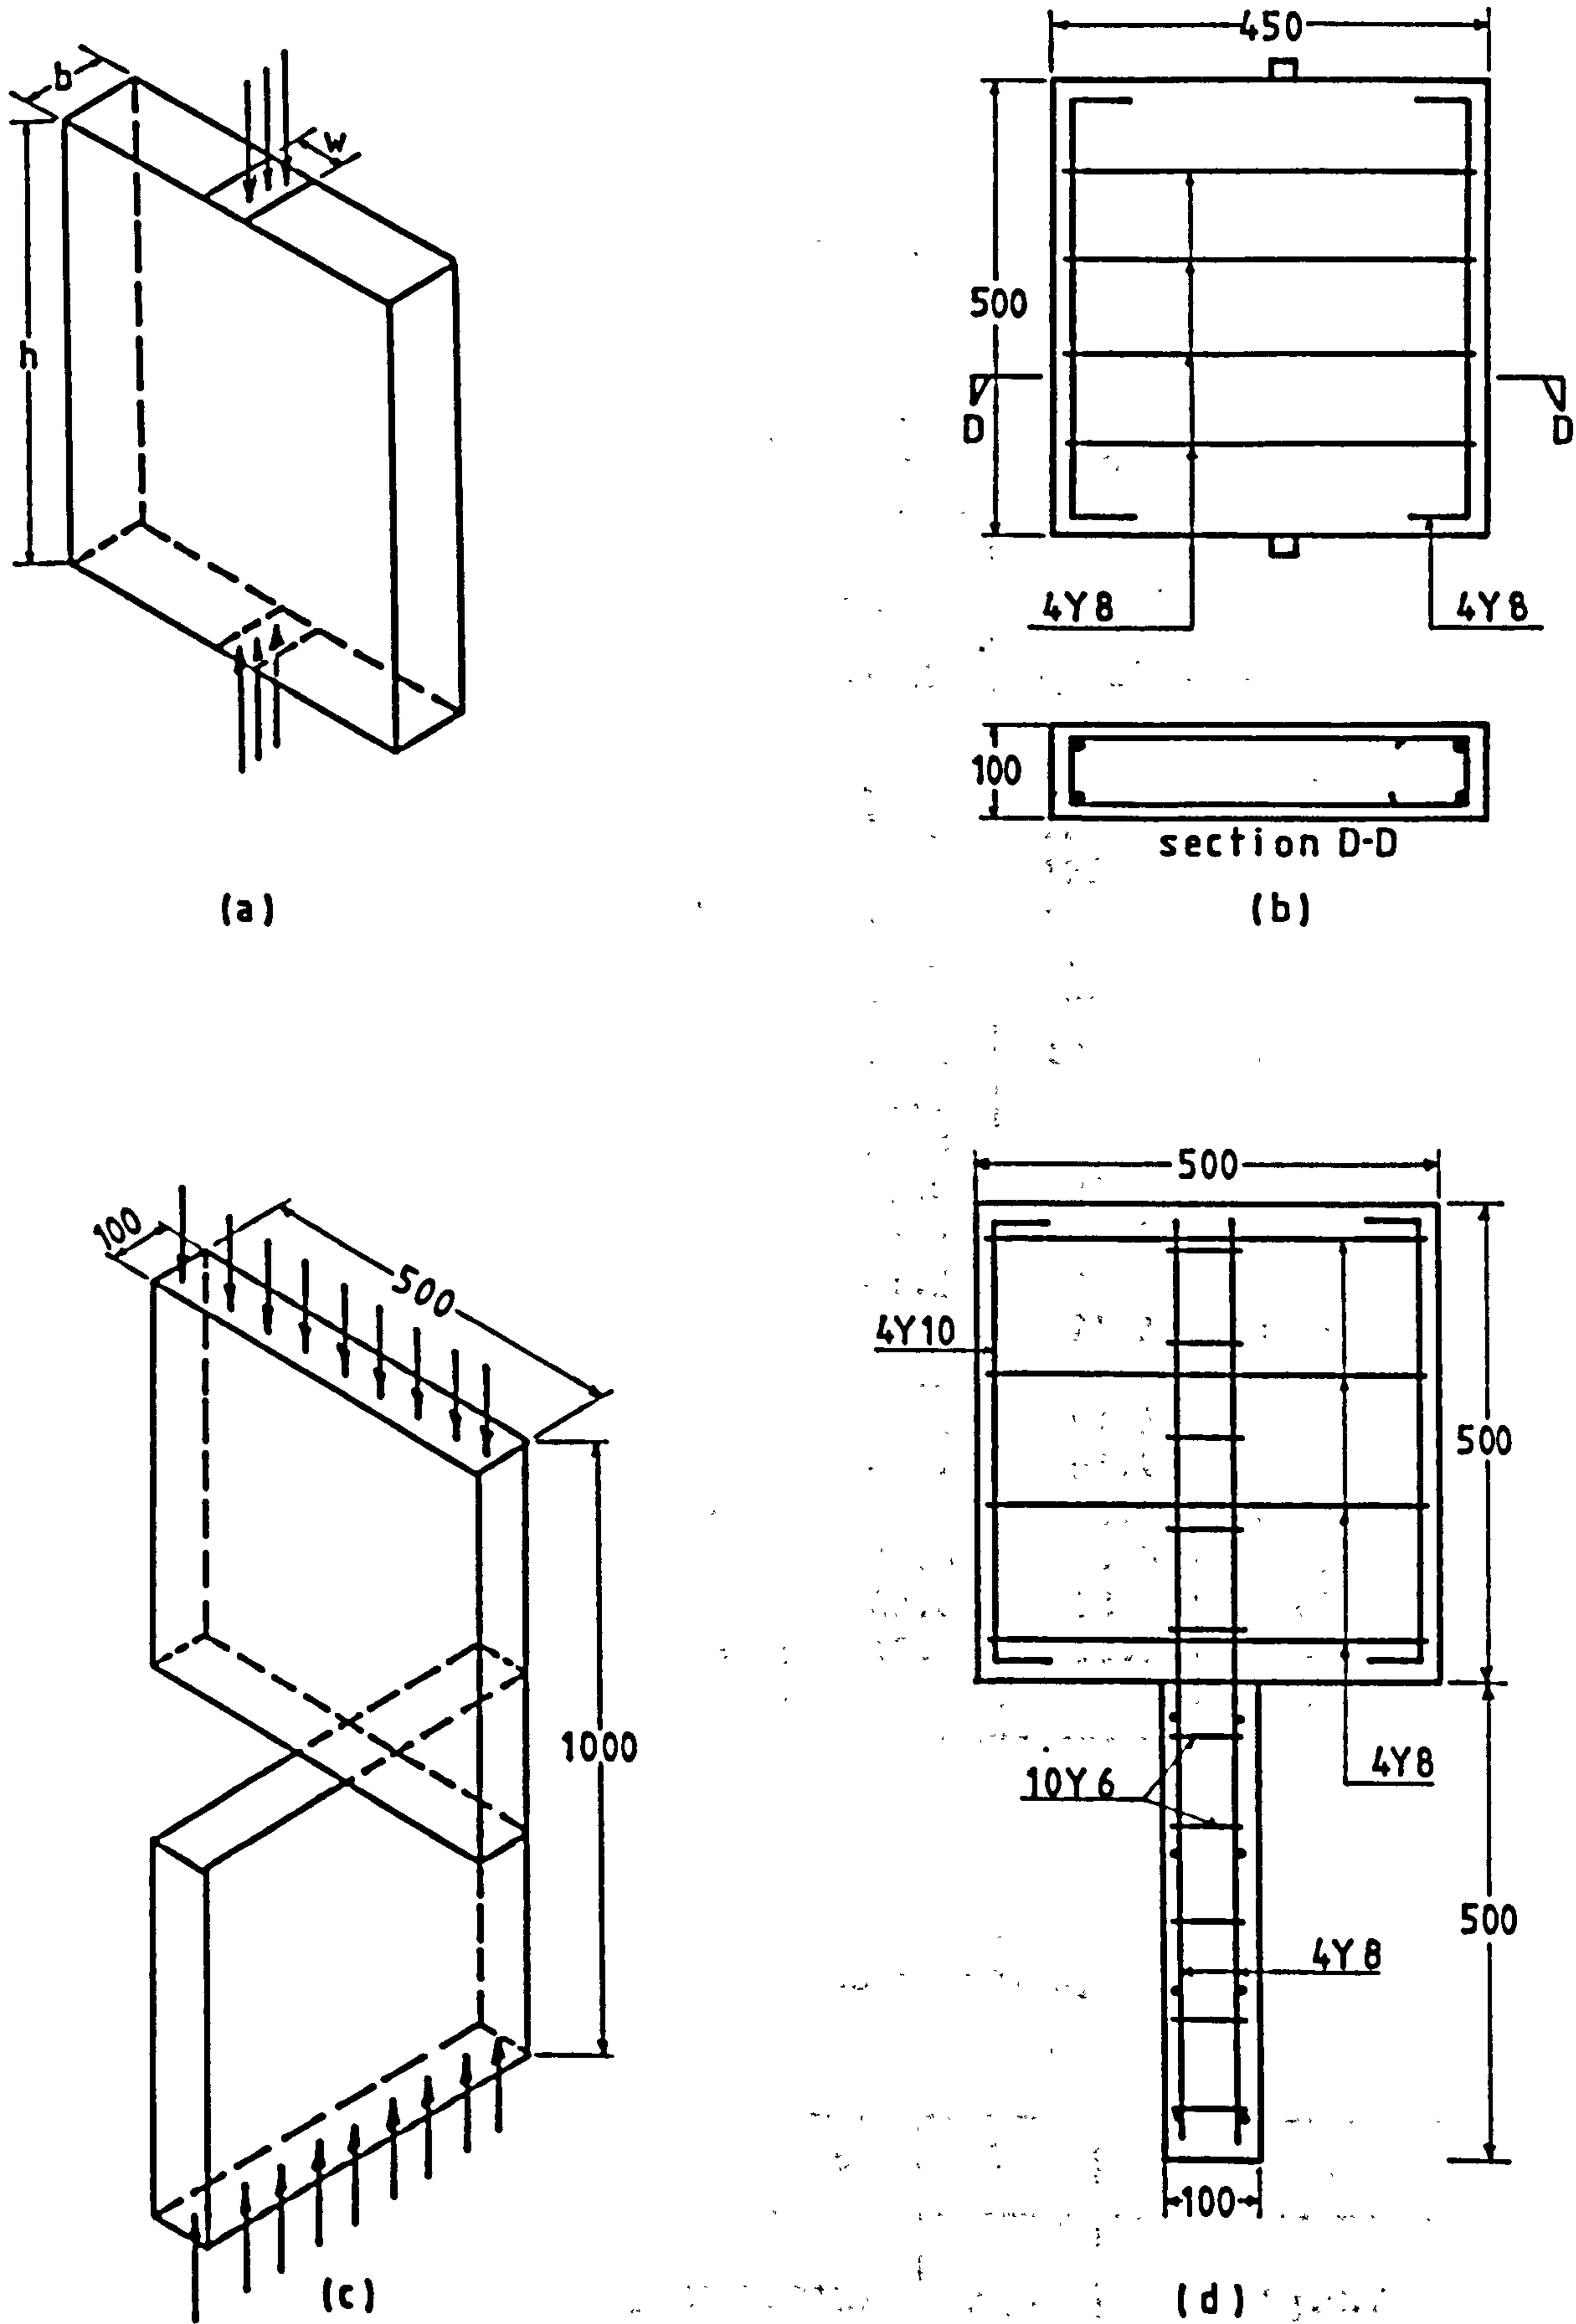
Geometrical and reinforcement details of specimen tested by Al-Najjim (1981). a) Isometric view of blocks A-E, b) typical reinforcement of blocks A-E, c) isometric view of cross-blocks, and d) typical reinforcement of cross-blocks specimens.
